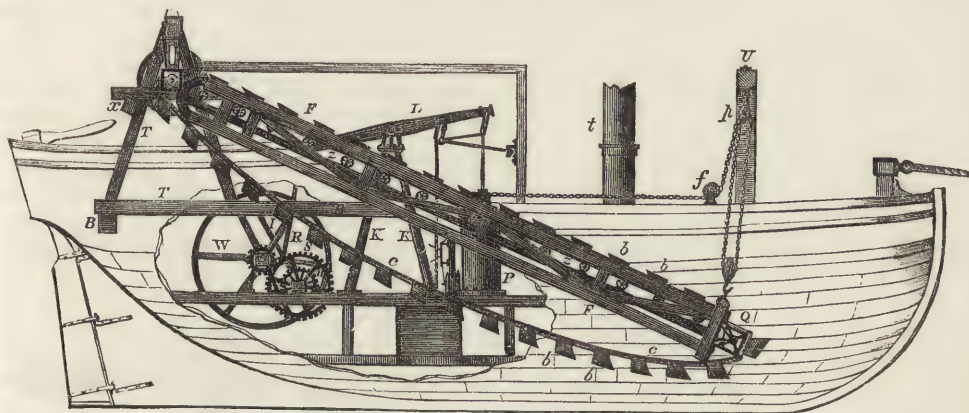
ELEVATION AND PARTIAL SECTION OF DREDGING MACHINE.
